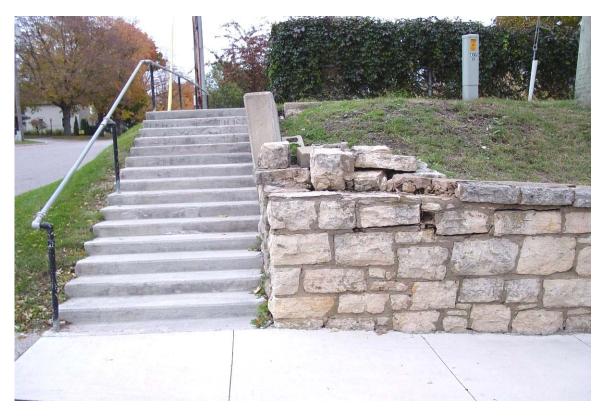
Northeast concrete steps, with leaning stone and concrete retaining walls, facing east
